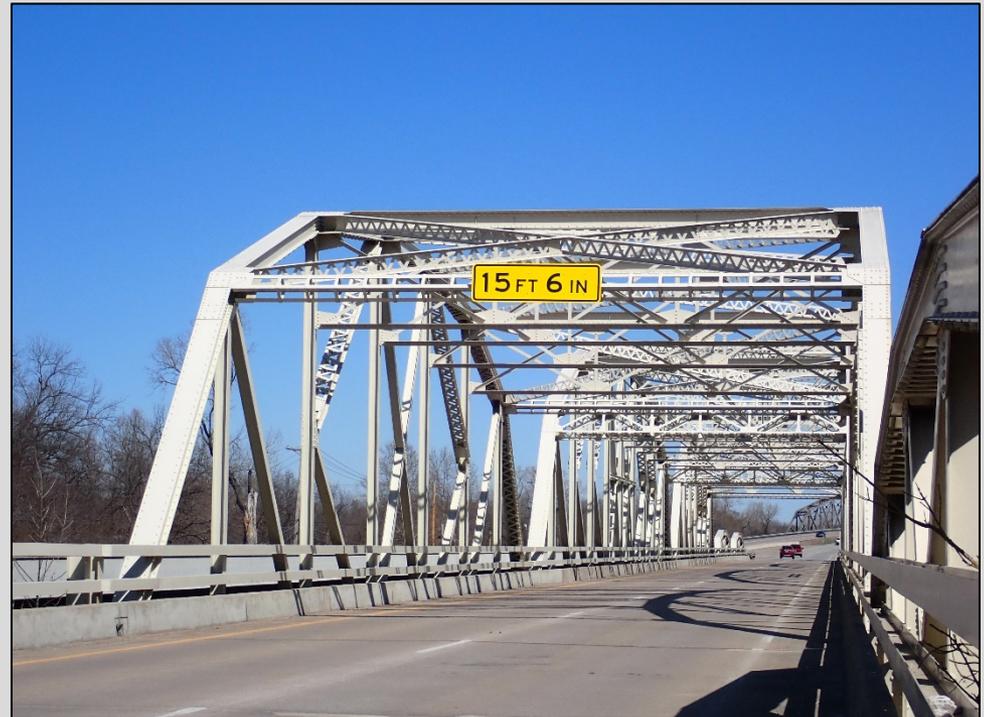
Overstressed Truss Members (Span 2) – Rehabilitation with Widening
